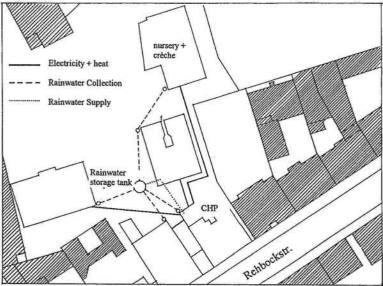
Rain water installation for 40 apartments, site plan Source: Blencke -96
